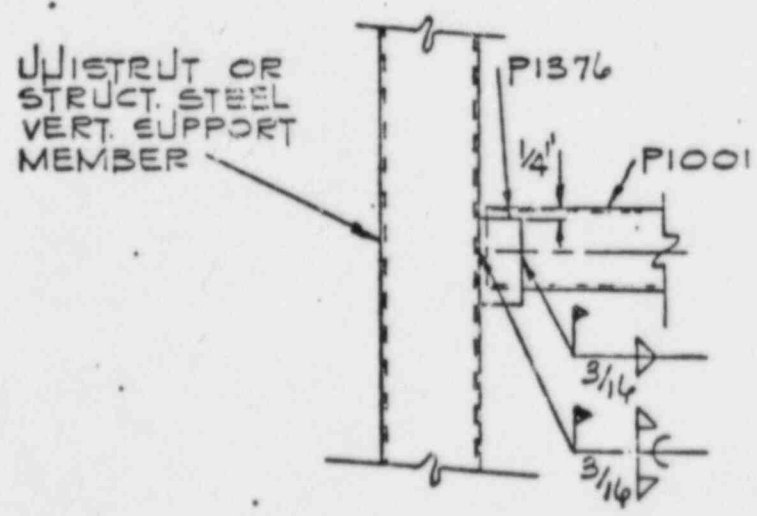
TYPICAL HORIZONTAL TO VERTICAL STRUCT. MEMBER CONNECTION
